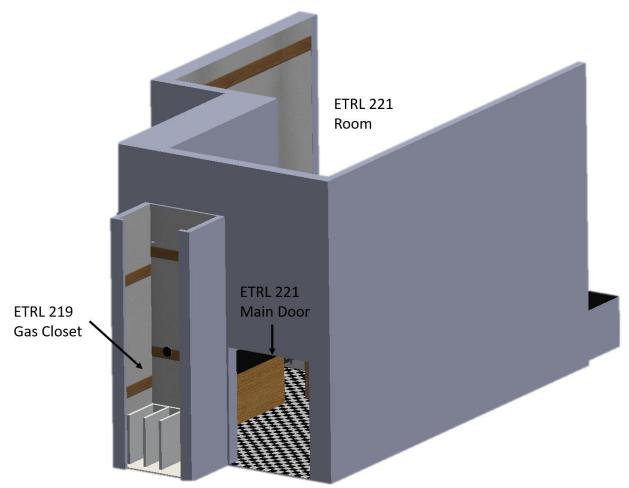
ETRL 221 and 219 renderings without ceiling and north wall with windows.
